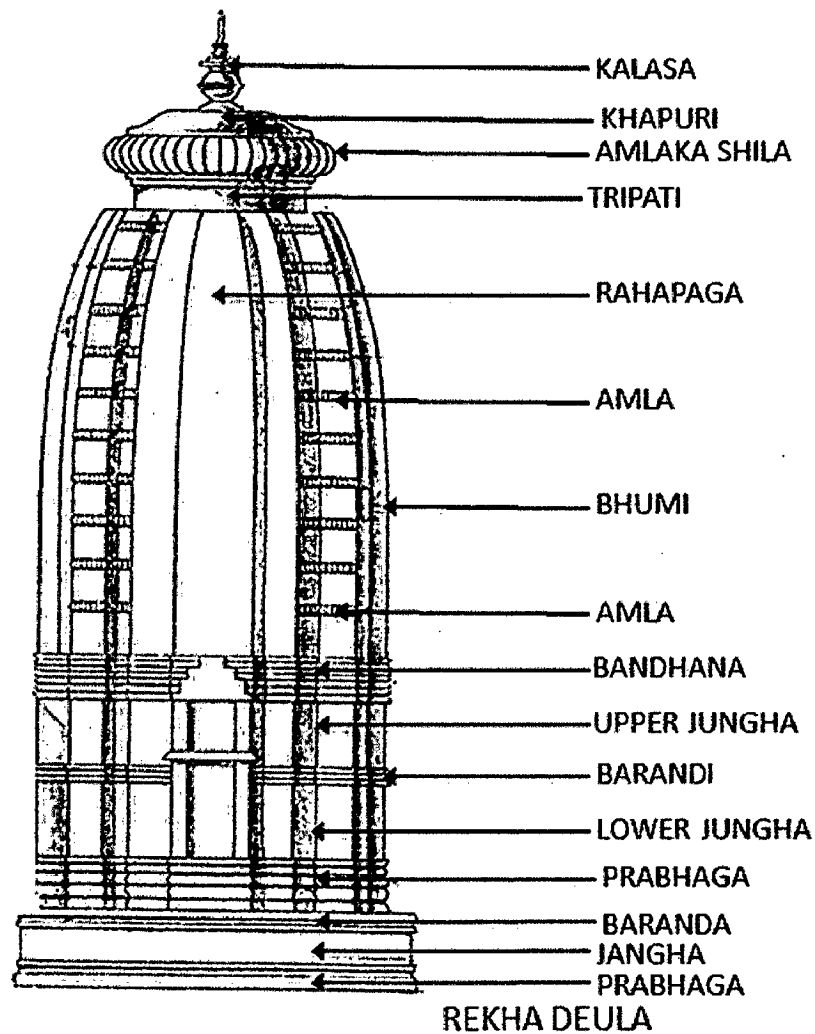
Typical Elevation of Orissan Rekha Deula
